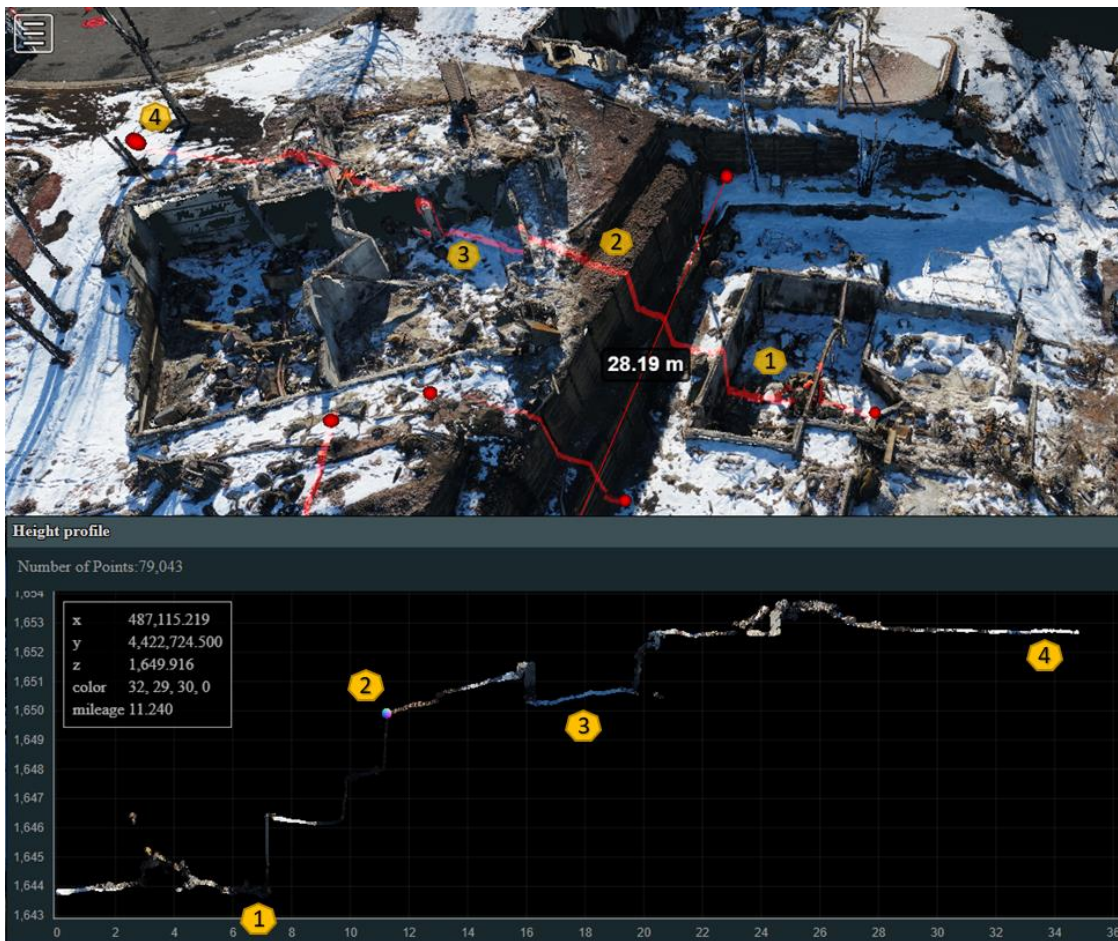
RS1 Profiles D (39°57'16.3" N, 105°09'02.2" W) showing (1) basement elevation, (2) top of retaining wall, (3) upper house basement level, and (4) upper ground level
